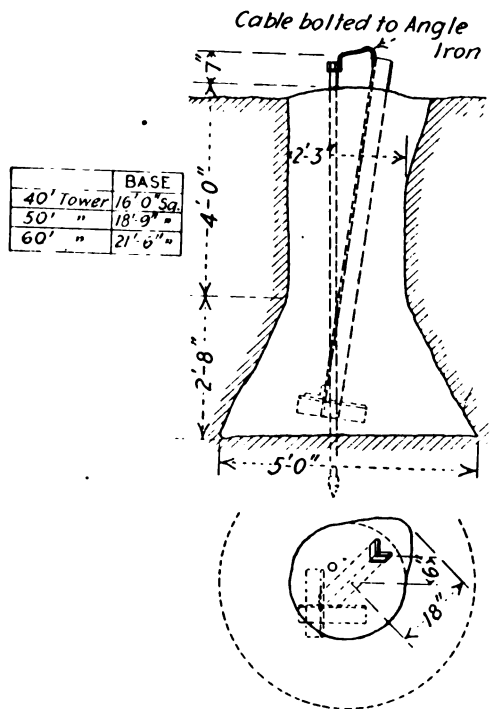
PENNSYLVANIA WATER AND POWER CO. CONCRETE FOUNDATION FOR HEAVY TOWERS
